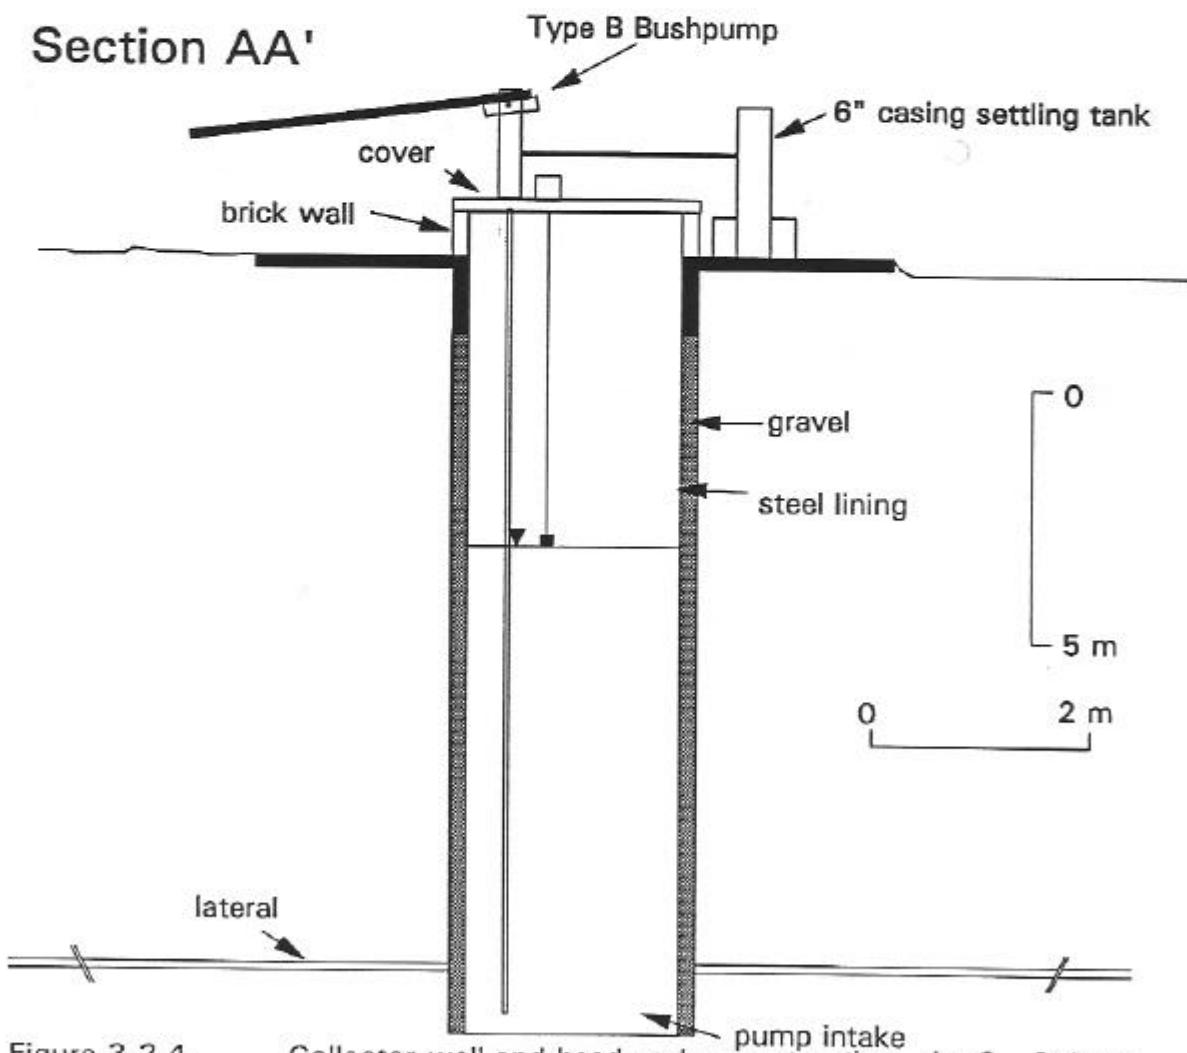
Collector well and headworks construction, site 2 , Gokota
